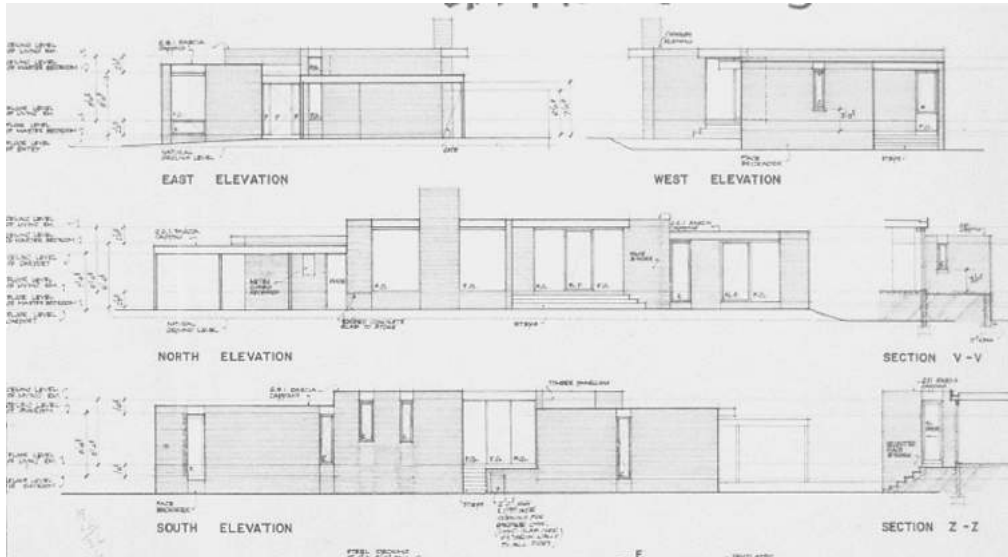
Working drawings, elevations for 19 Haywood Street, Beaumaris, 1969 (Source: Bayside Council Building Files)
